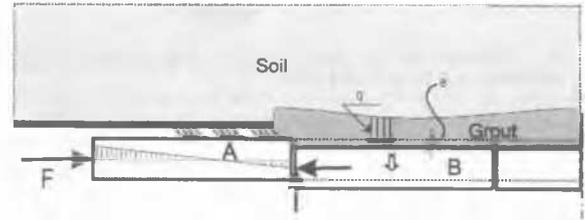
Eccentricities due to partial loading during tunnel construction of the tunnel lining, where tunneling a is unloaded in radial direction and tunneling b is subjected to radial loads by grouting-pressures
